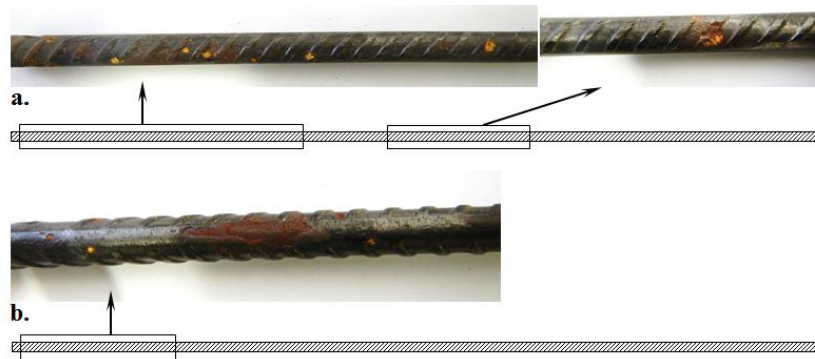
Corrosion pits on reinforcement bars of uncracked beam specimens (a) F2D-UC-M3, and (b) G2D-UC-M1 (Sketch shows section of rod shown in the picture)
